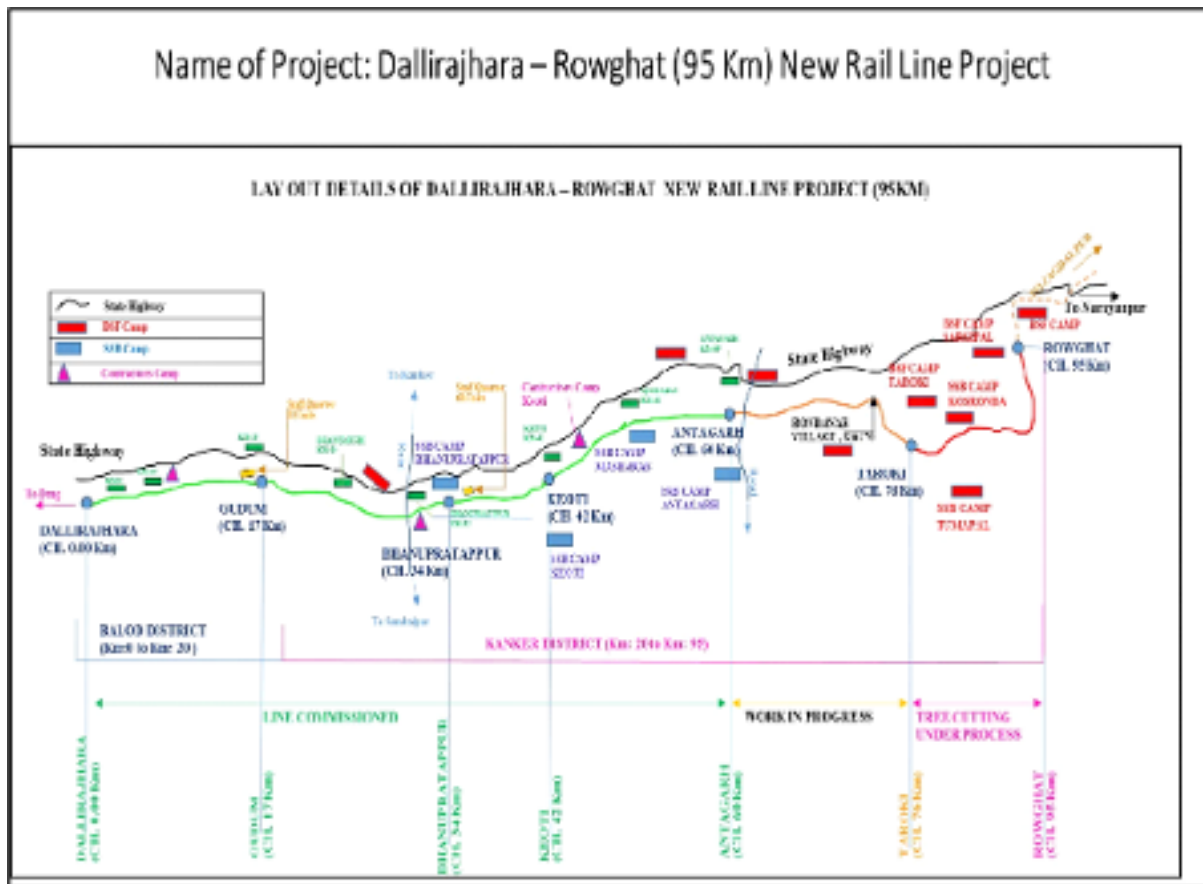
Layout details of Dalli-Rajhara-Rowghat new railway line project
